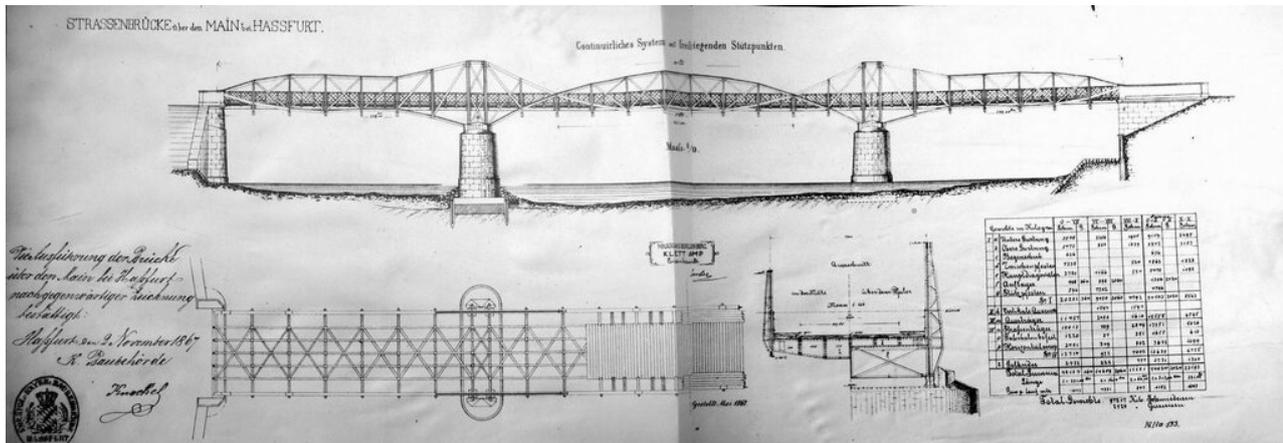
Haßfurth Bridge 1867, constructed according to Gerber's patent for cantilever-beams; (MAN 121.7)
